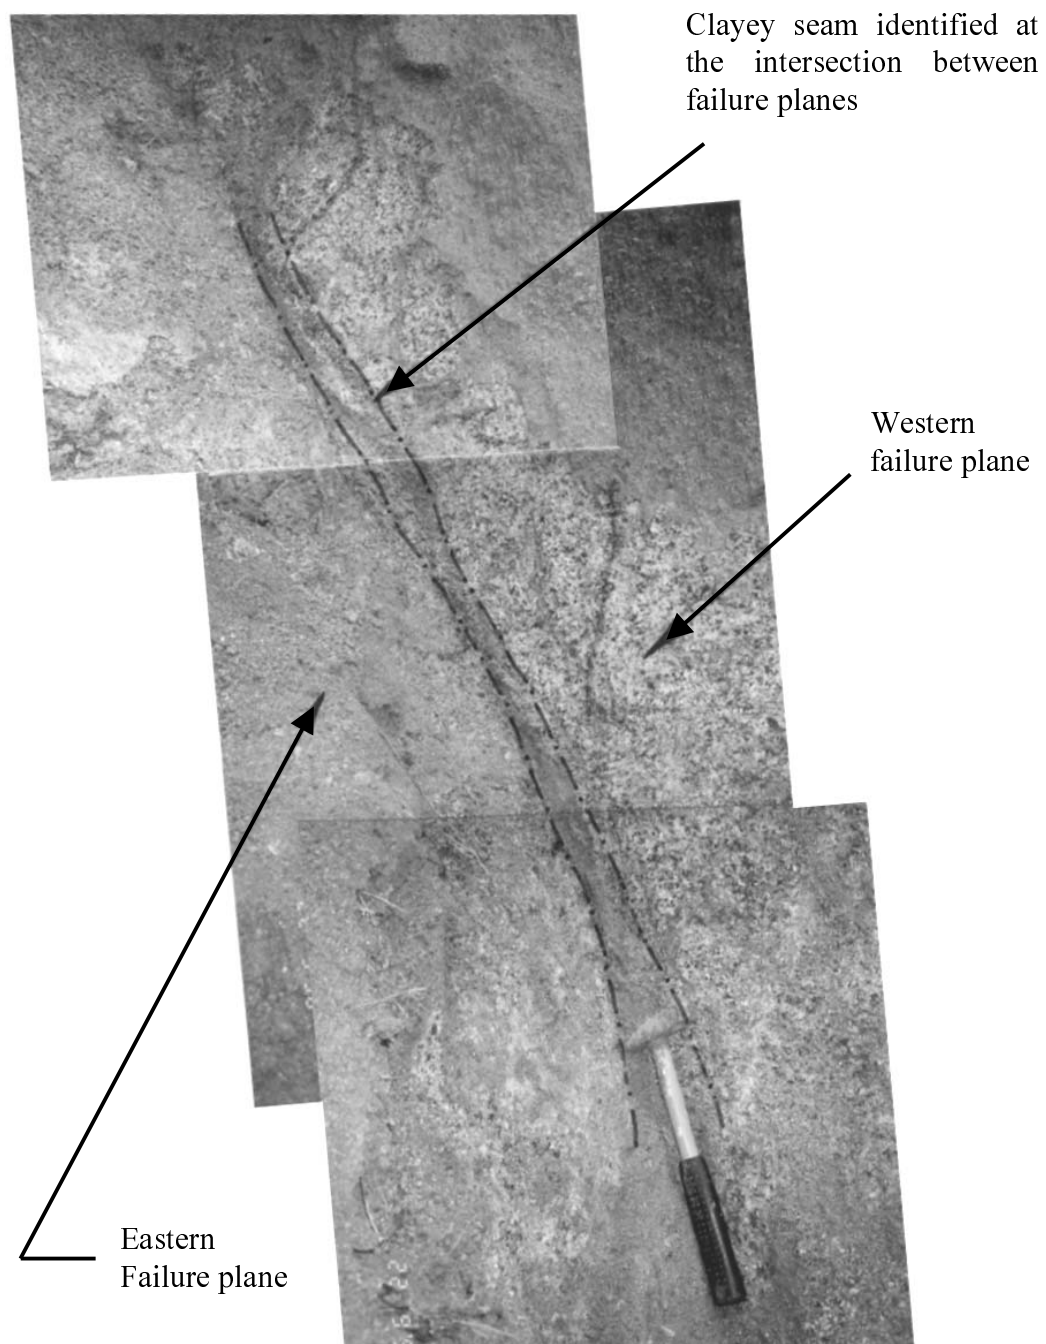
View of Clayey Seam at the Intersection between Failure Planes
